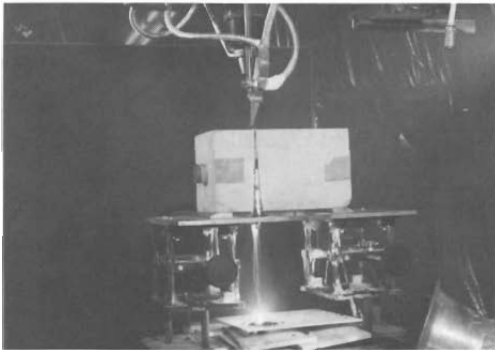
Laser Cutting of Concrete Specimen Reinforced by Deformed Bar D 41
